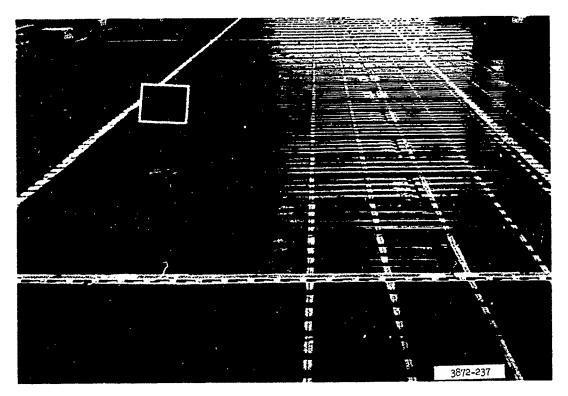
Test section 1, lane 2, item 1, after failure at 120 coverages
